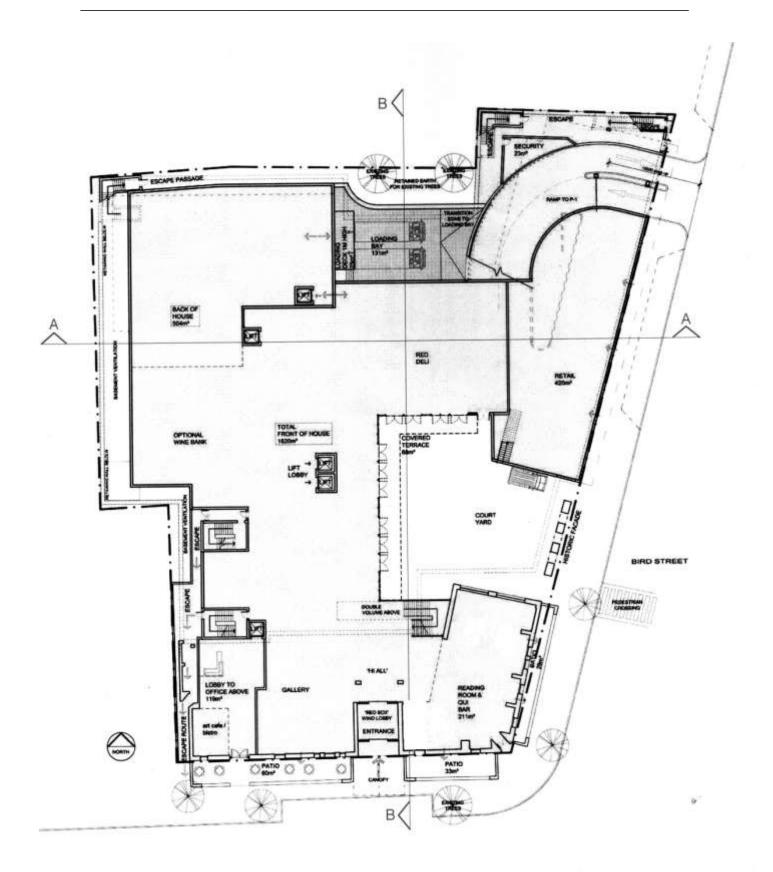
Proposed Ground Floor Plan (DHK Architects)
